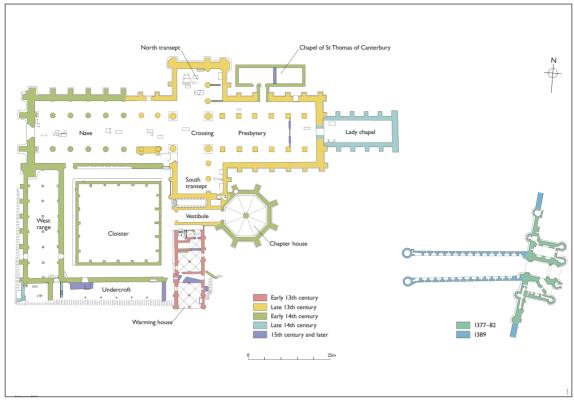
Site plan of Thornton Abbey. ©Historic England Archive
